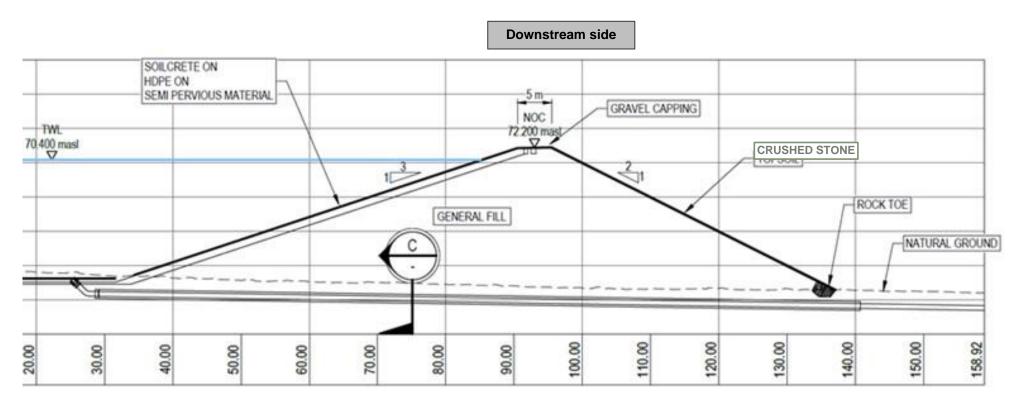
Illustrative cross section through the proposed balancing dam embankment
